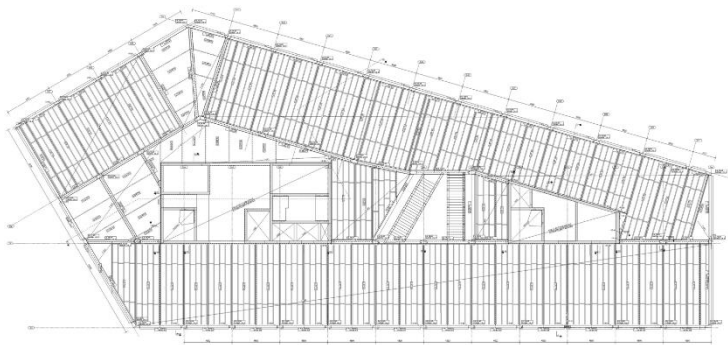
Typical structural floorplan, showing the main load-bearing components.
